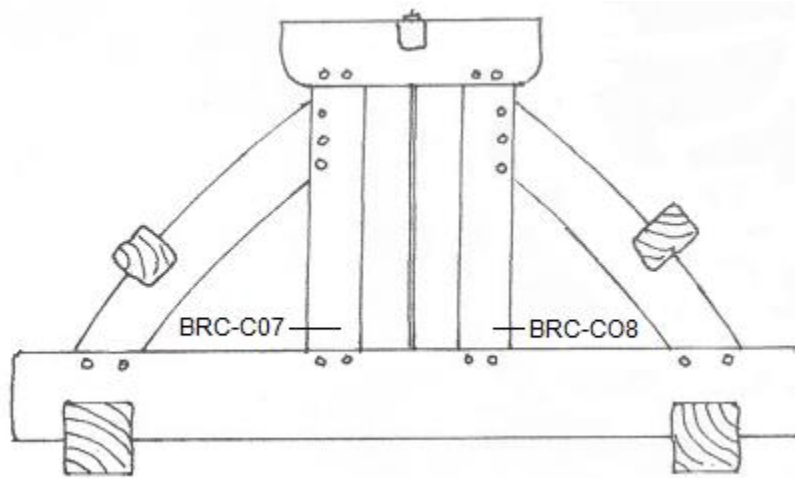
Truss B, showing the location of samples BRC-C07 and BRC-C08
